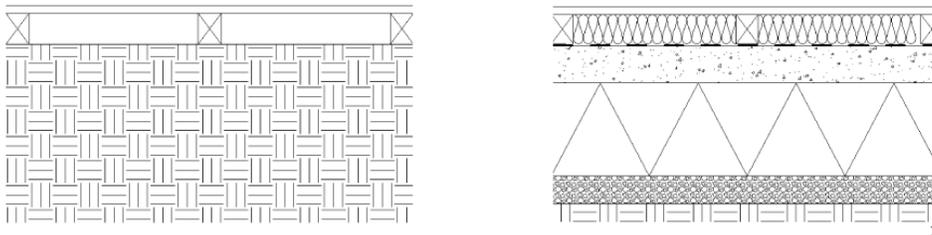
Ground floor slab renovation. Renovation methods as follows: Existing condition, EPS addition.
